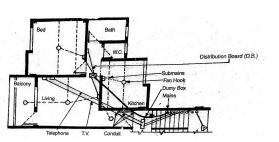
Electrical Drawing of Concealed Conduits in Slab
